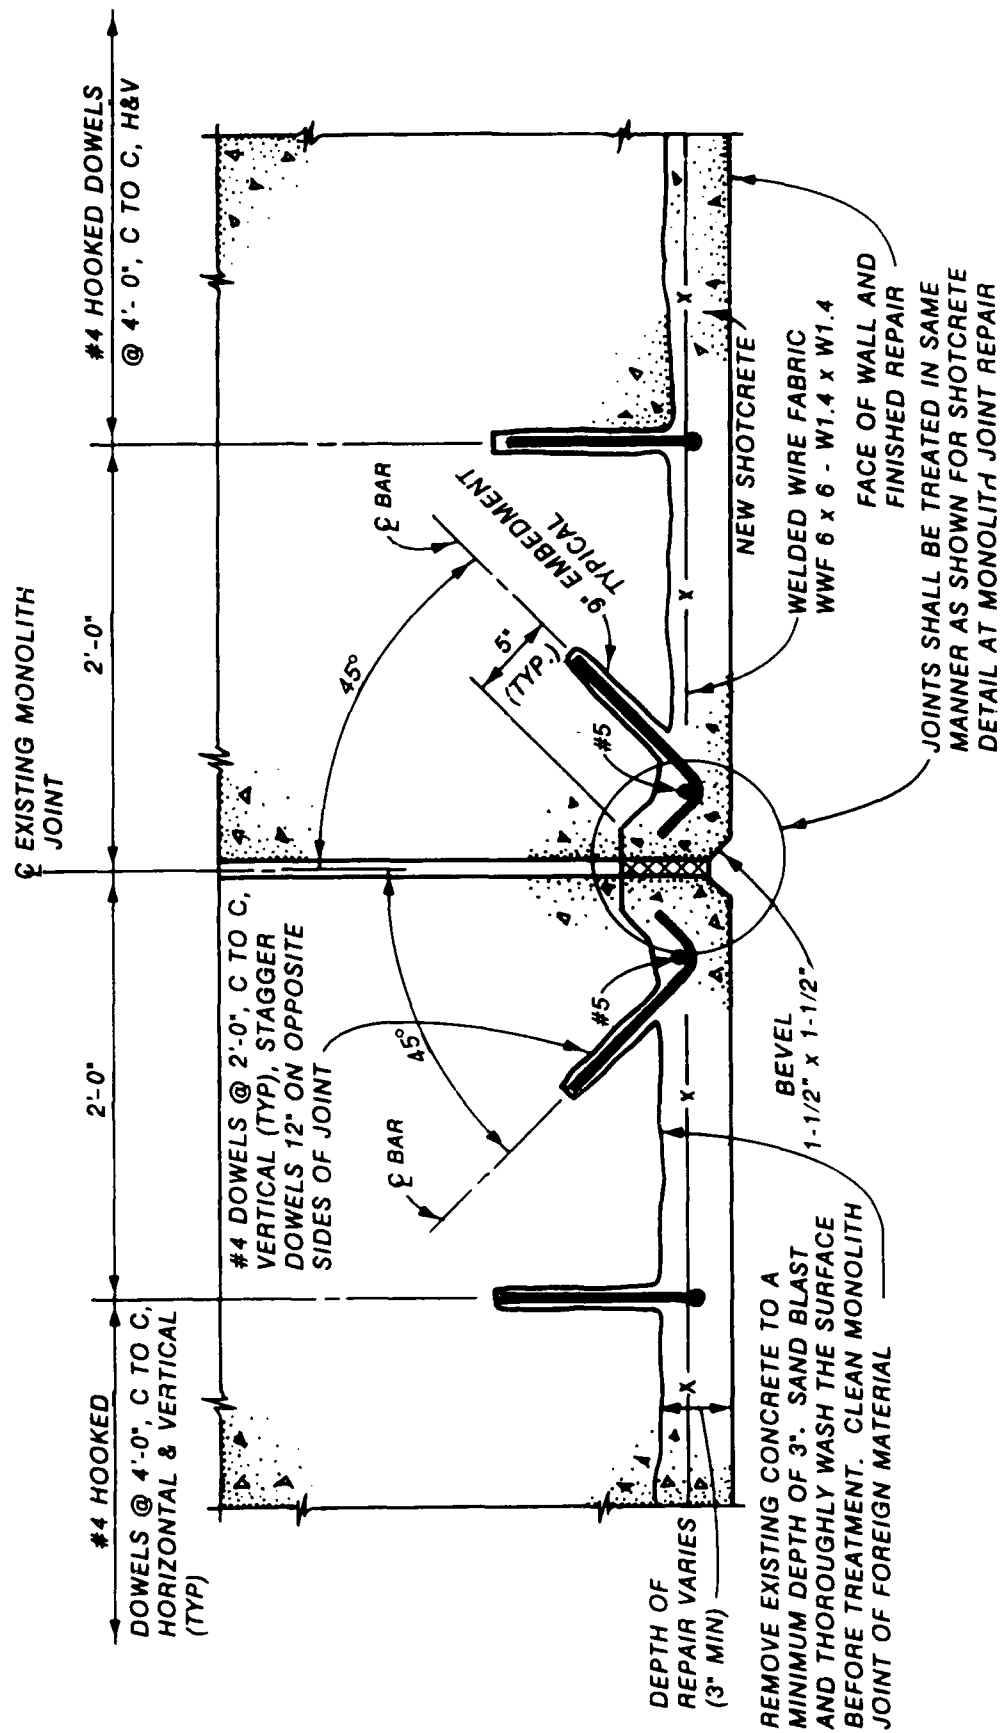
Shotcrete resurfacing monolith joint repair details, Emsworth Locks
